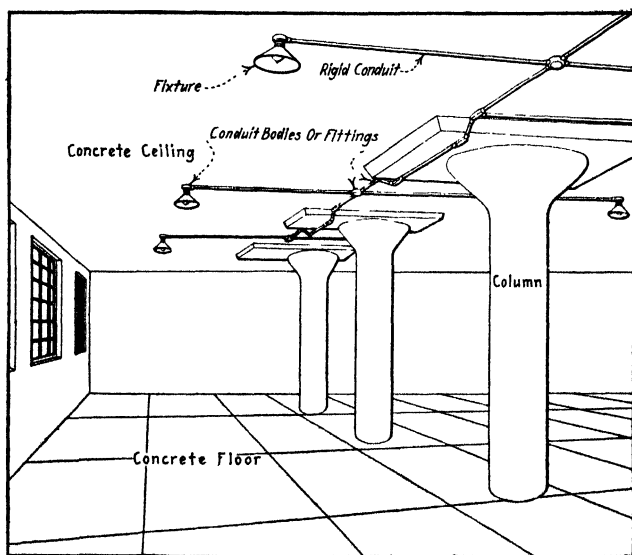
A neat installation of exposed surface conduit wiring on the ceiling of a warehouse room of reinforced-concrete construction. Note that a number of offsets might have been avoided if the conduits had been kept clear of the abacuses of the columns.
